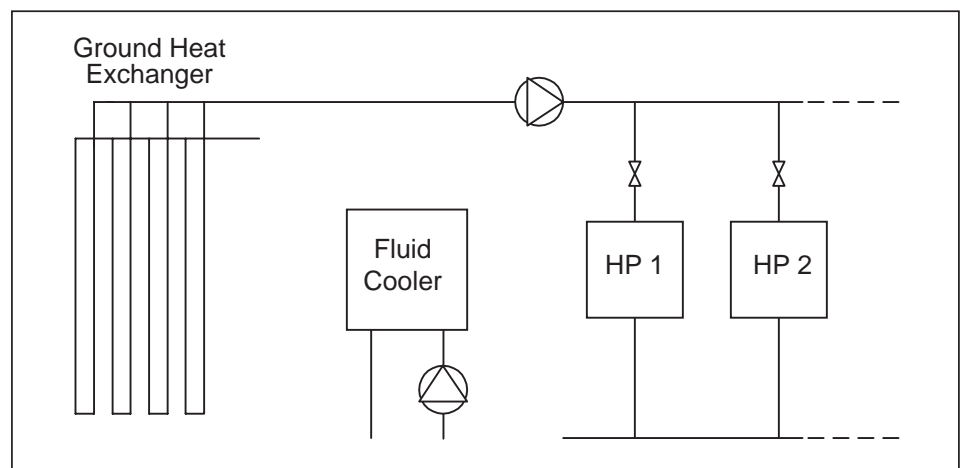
Possible Series Fluid Cooler Piping Arrangement—Suitable for smaller coolers where pumping head would not become excessive.
